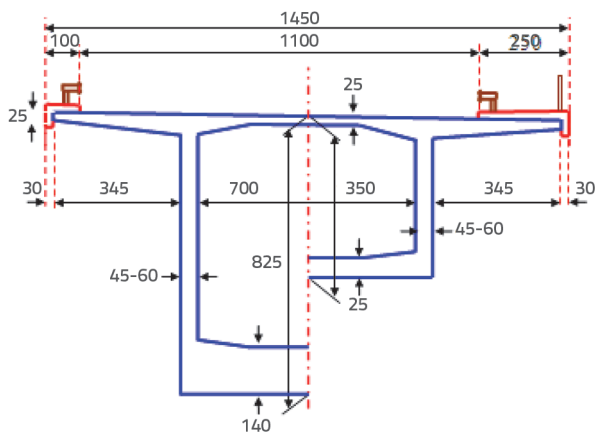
Dimensions of box girder cross-section (all dimensions are cm)
